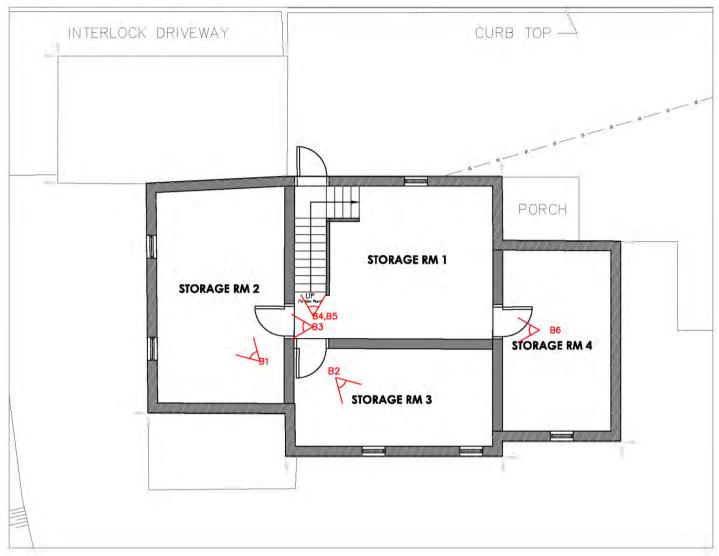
Basement Floor Key Plan, not to scale, sketch by AREA, annotated to refer to Photos B-1 to B-6
